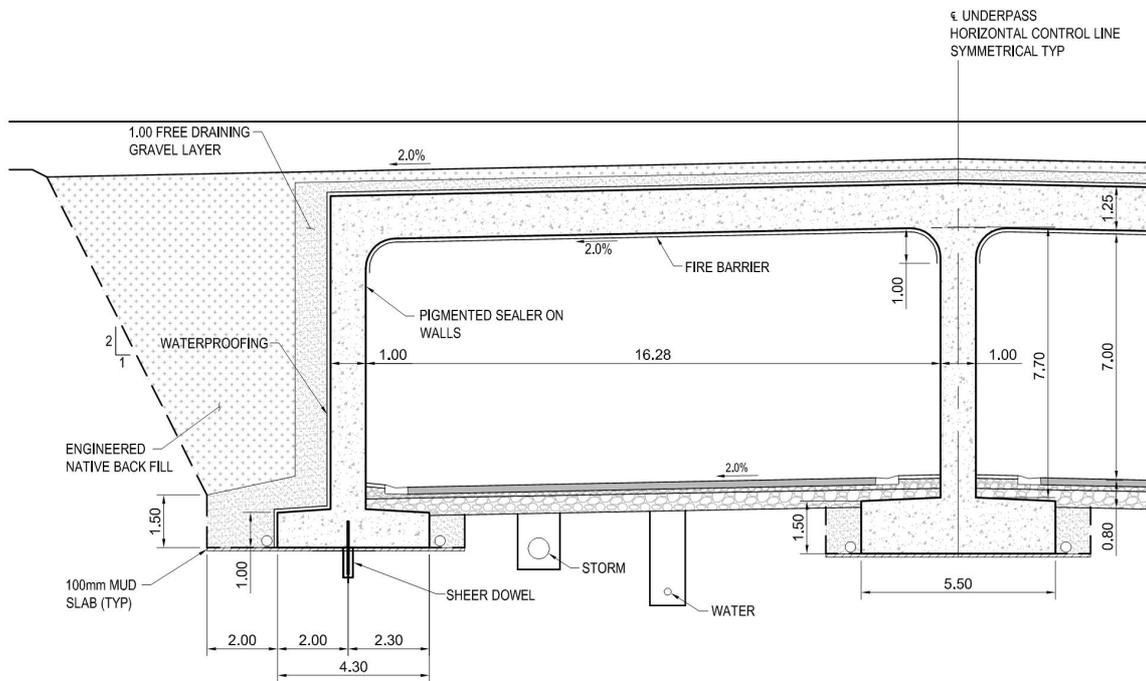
TYPICAL SECTION OF TUNNEL WITHOUT APPROACH SLAB, AREAS AWAY FROM TAXIWAYS AND RUNWAY
